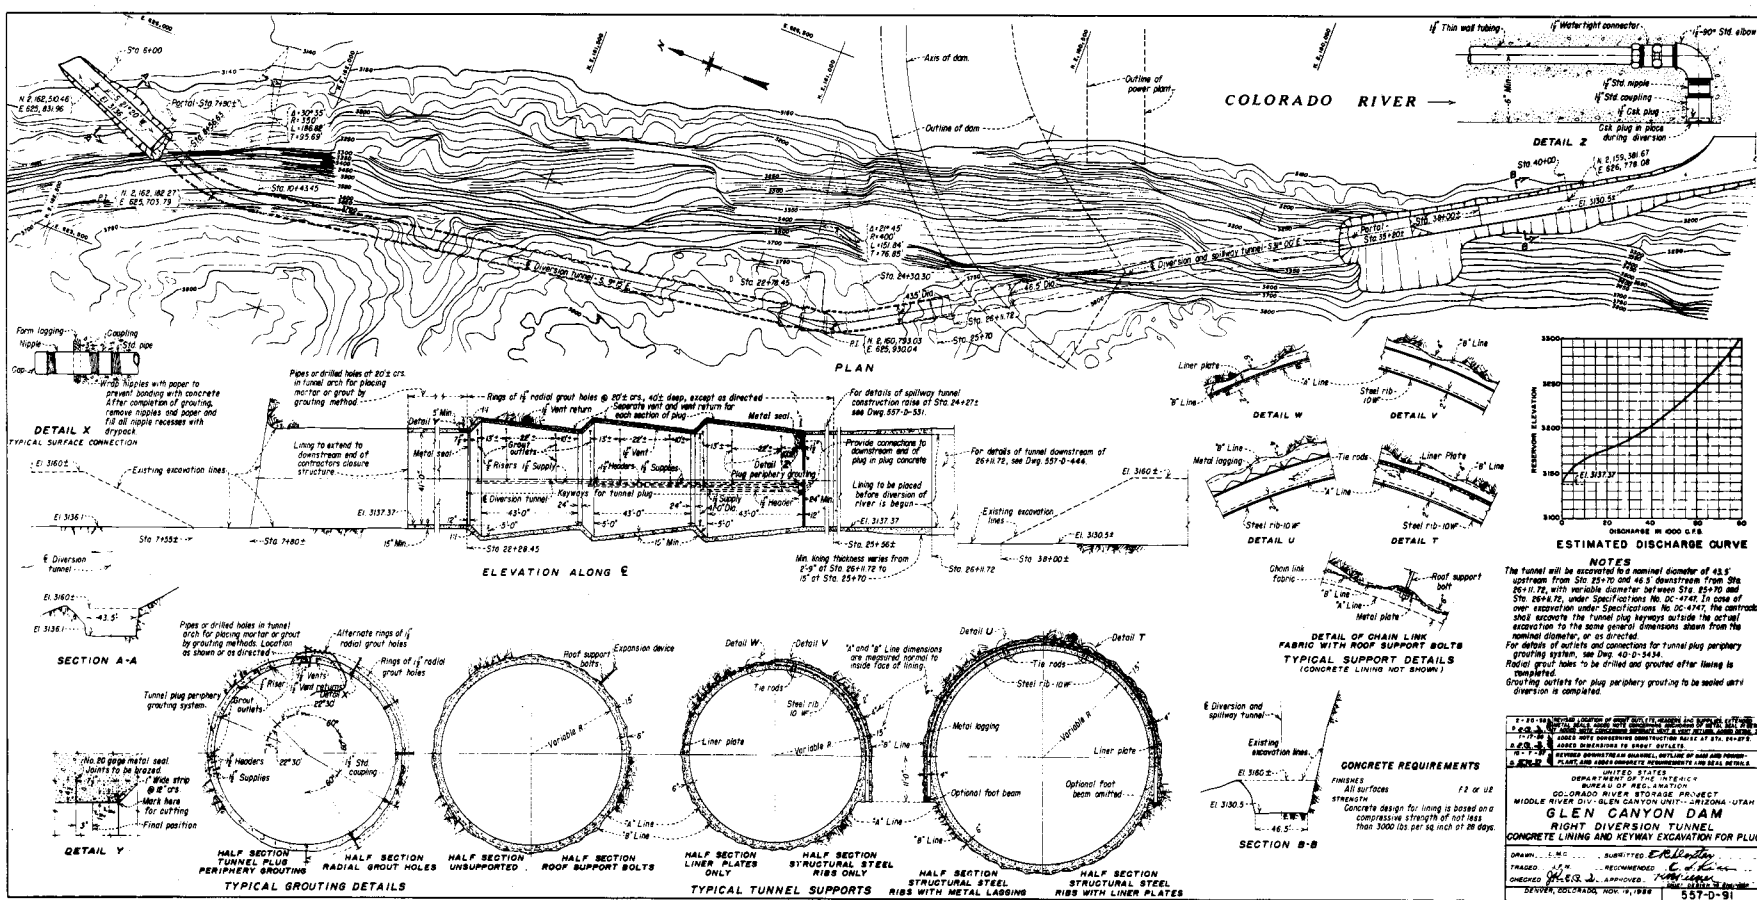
Right diversion tunnel—Concrete lining and keyway excavation for plug.
